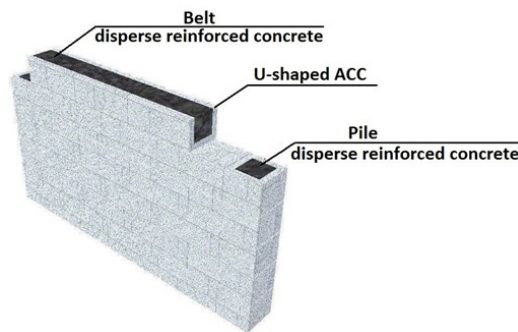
Autoclaved aerated concrete (ACC) confined with disperse reinforced concrete piles
